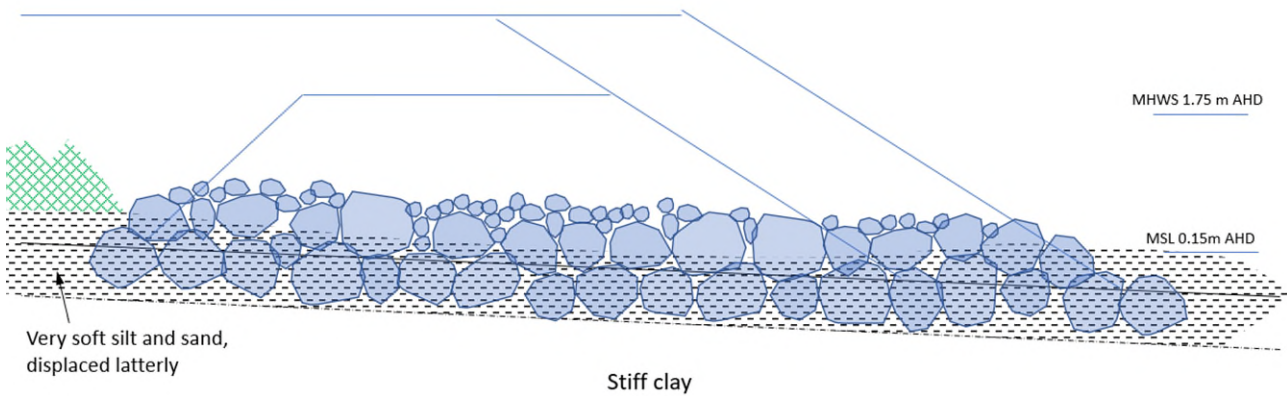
Typical cross section of reclamation area and proposed construction bund
